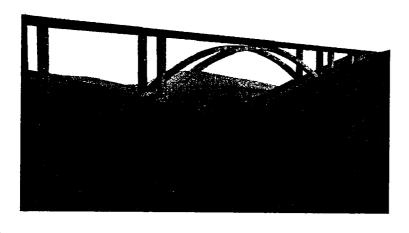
SPECIAL STRUCTURES STEEL THROUGH-ARCH BRIDGE
